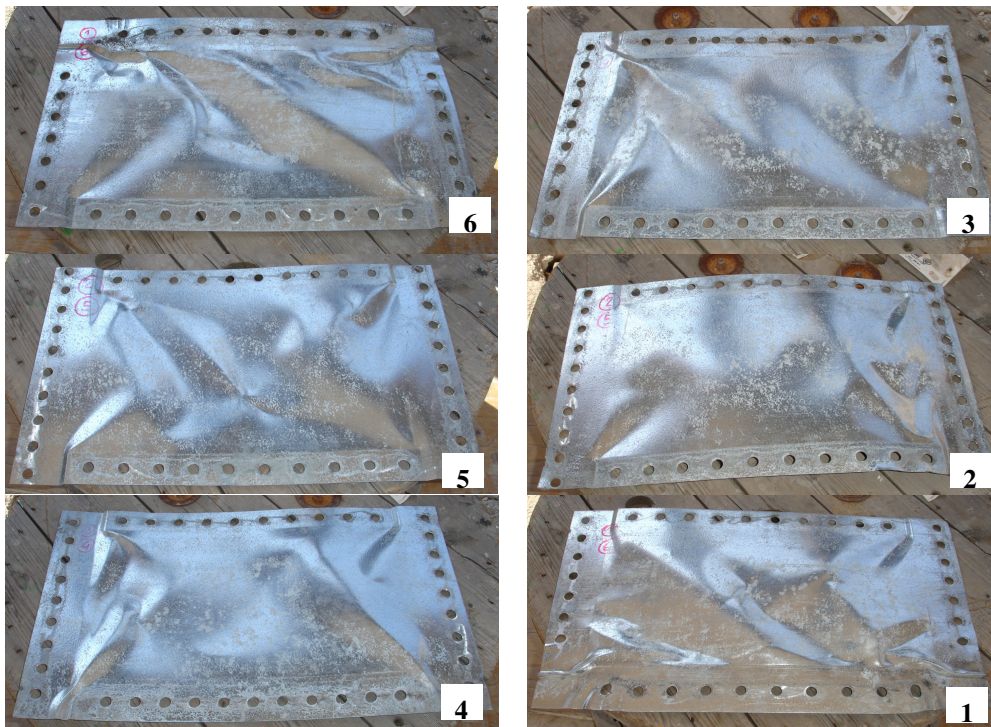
Deformed shapes of sub-panels belonging to the shear wall located at the back side of the RC structure
